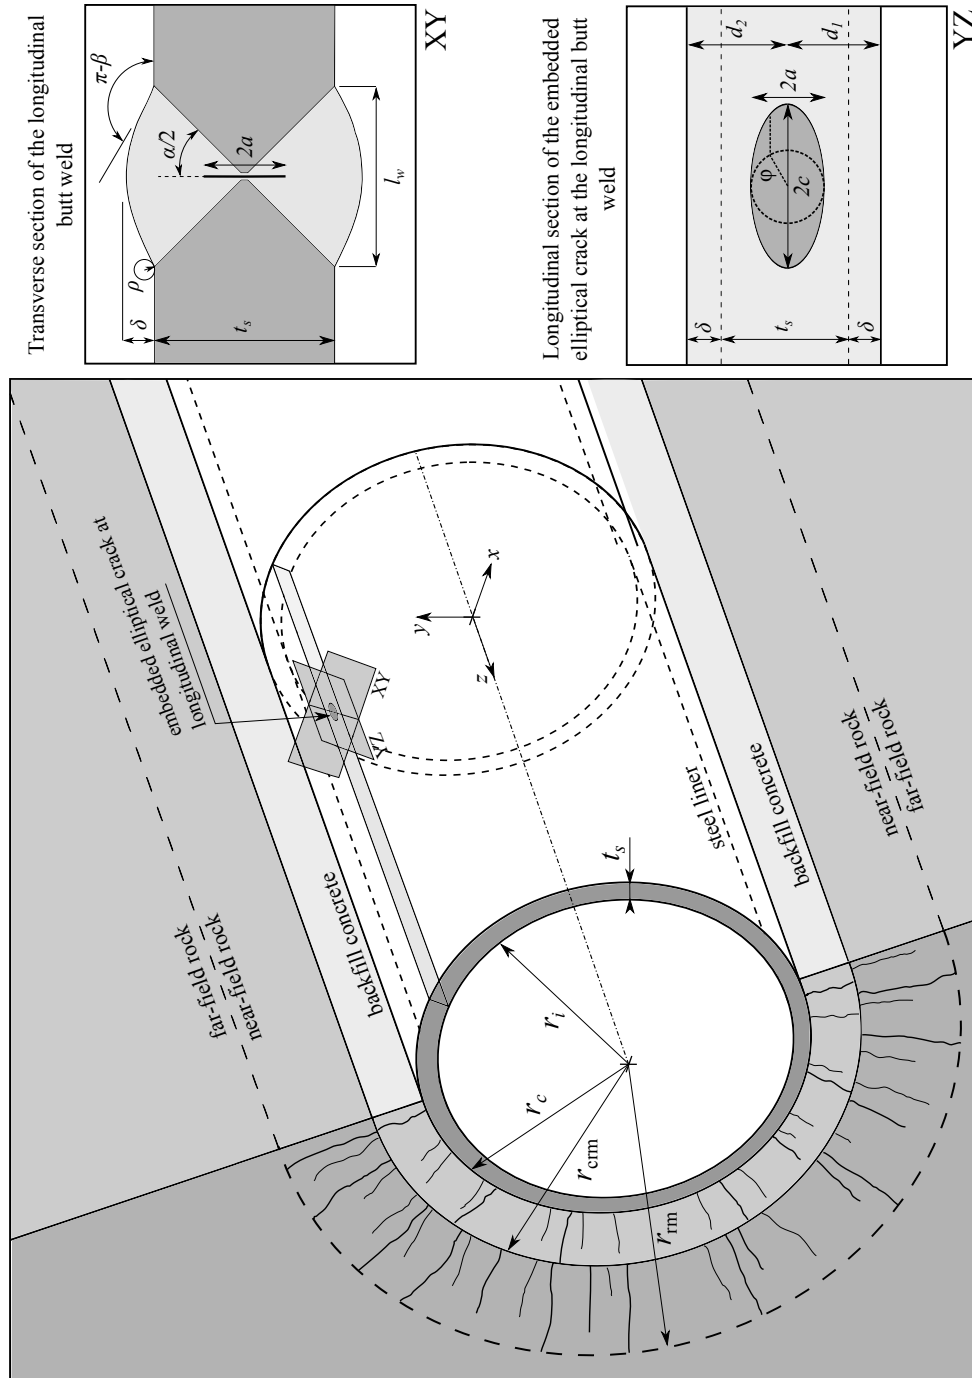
Definition sketch of a steel-lined pressure tunnel or shaft with an axial embedded elliptical crack at the longitudinal butt welded joint. The slenderness of the steel liner is distorted for the sake of presentation.
